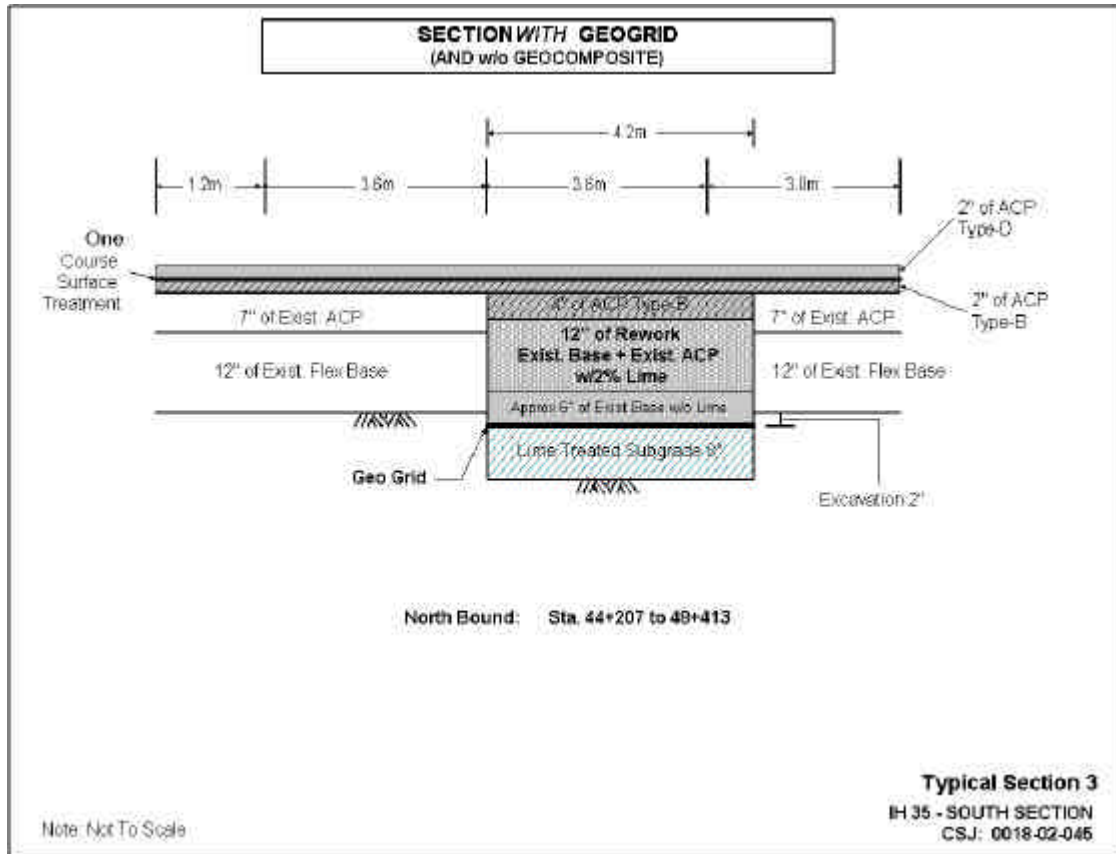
Proposed South Typical Section 3 of IH 35 in Laredo District.
